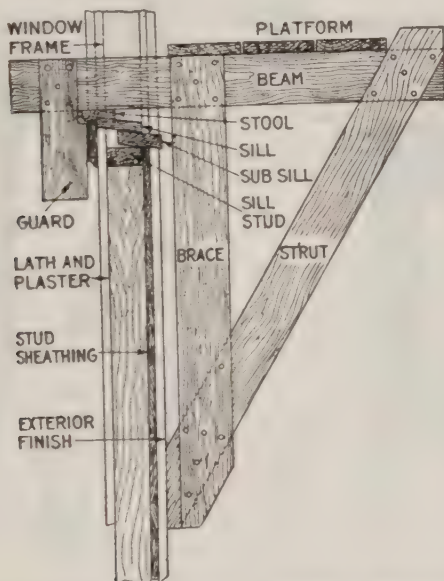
,084.—Window form of bracket scaffold. *As shown*, the platform beam is supported by the window sill and the strut whose lower end presses against the sheathing.
